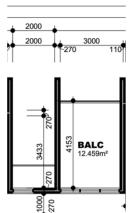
Articulated area and side balcony within Unit 5, situated on the first floor (MacGillivray Architects, 2017)
